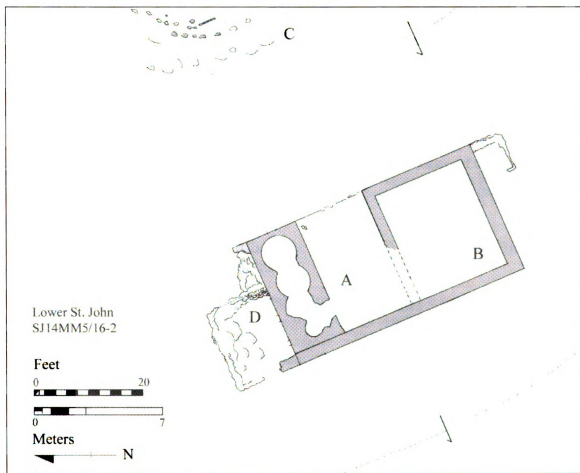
Lower St John mill site plan. SJ14MM5/16-2. The mill has striking similarity to the Long point road site. However, this boiling table was enclosed by a masonry structure. A: Boiling house. B: Curing facility. C: Mill platform. D: Fireboxes and building addition enclosing fireboxes.
